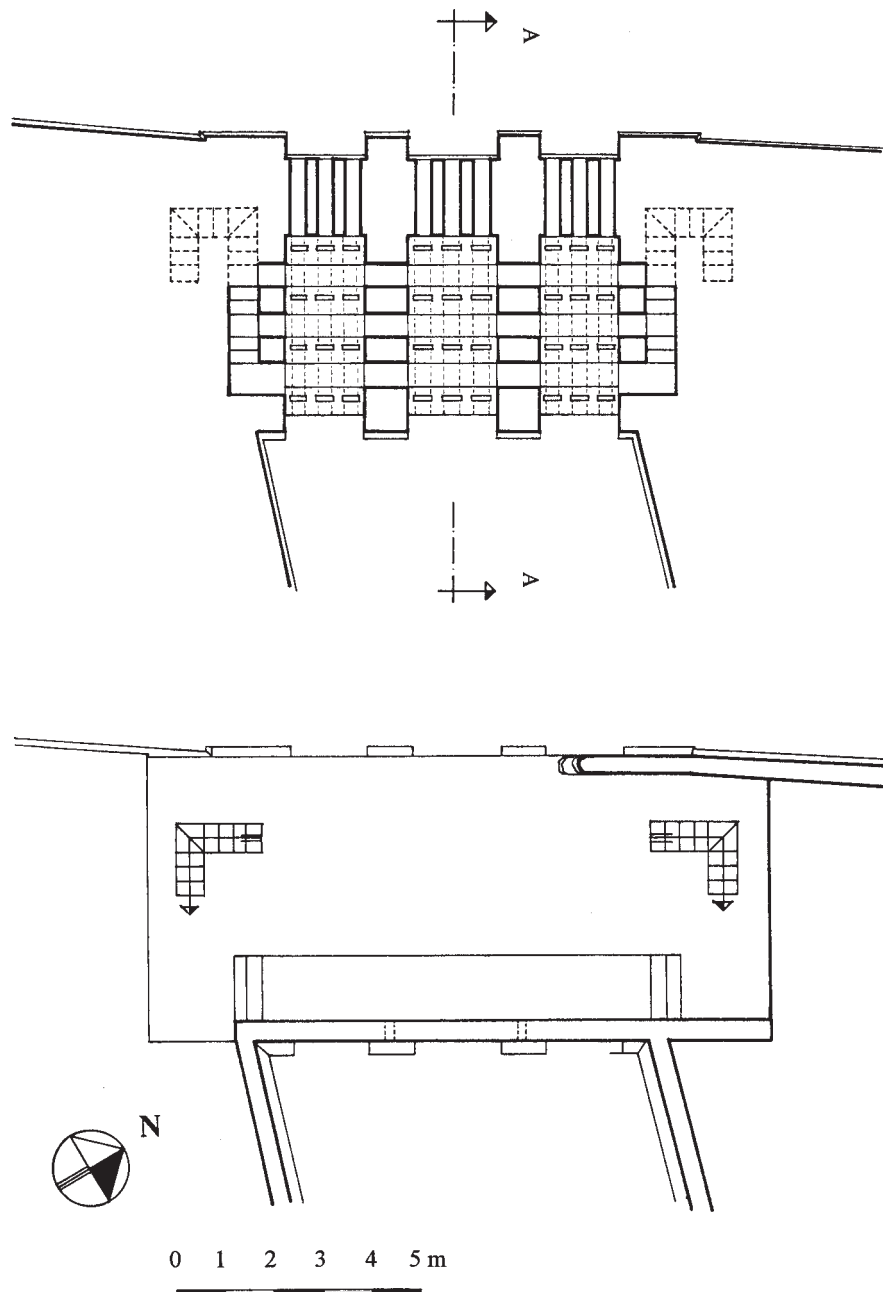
Sluice gate, plan at roof level below and plan of the sluices (the line of plan level is shown in section A-A).
